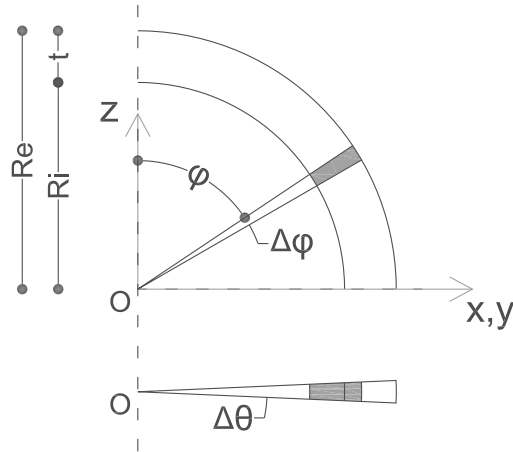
Example 3. Geometry of a hemispherical dome and a typical “voussoir” in section and plan.
